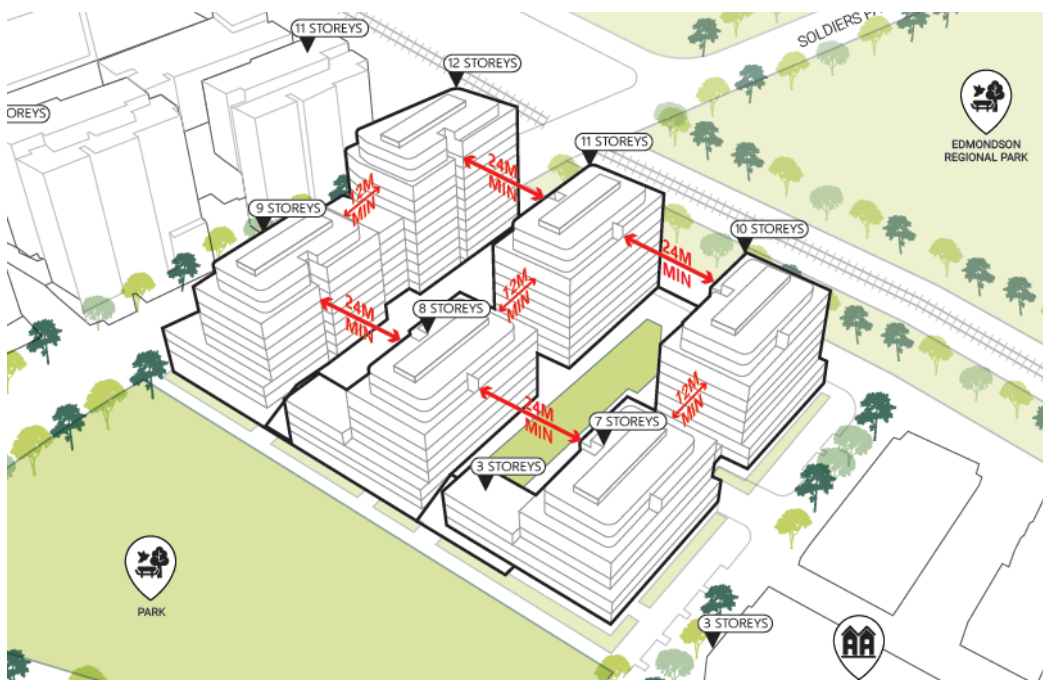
Illustrative Design Scheme showing ADG compliant building separation
